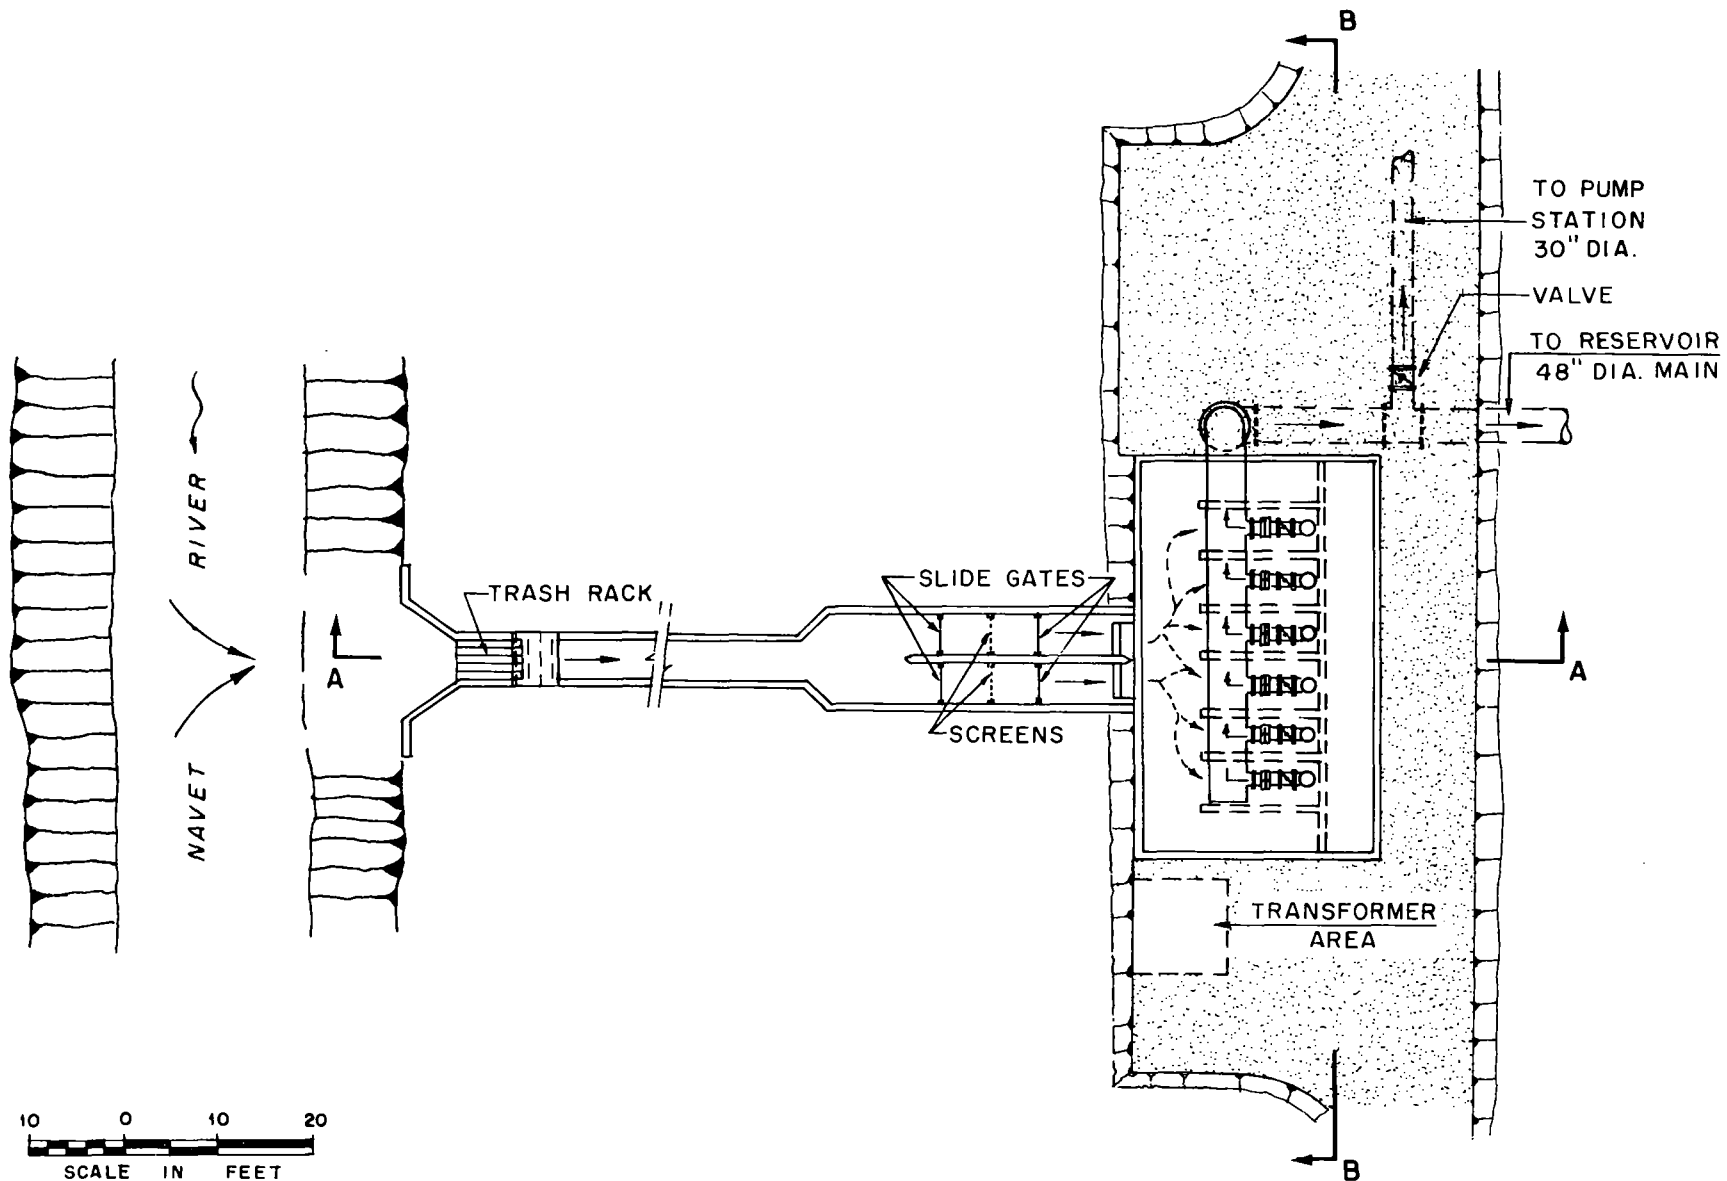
NAVET INTAKE AND PUMP STATION – PLAN
